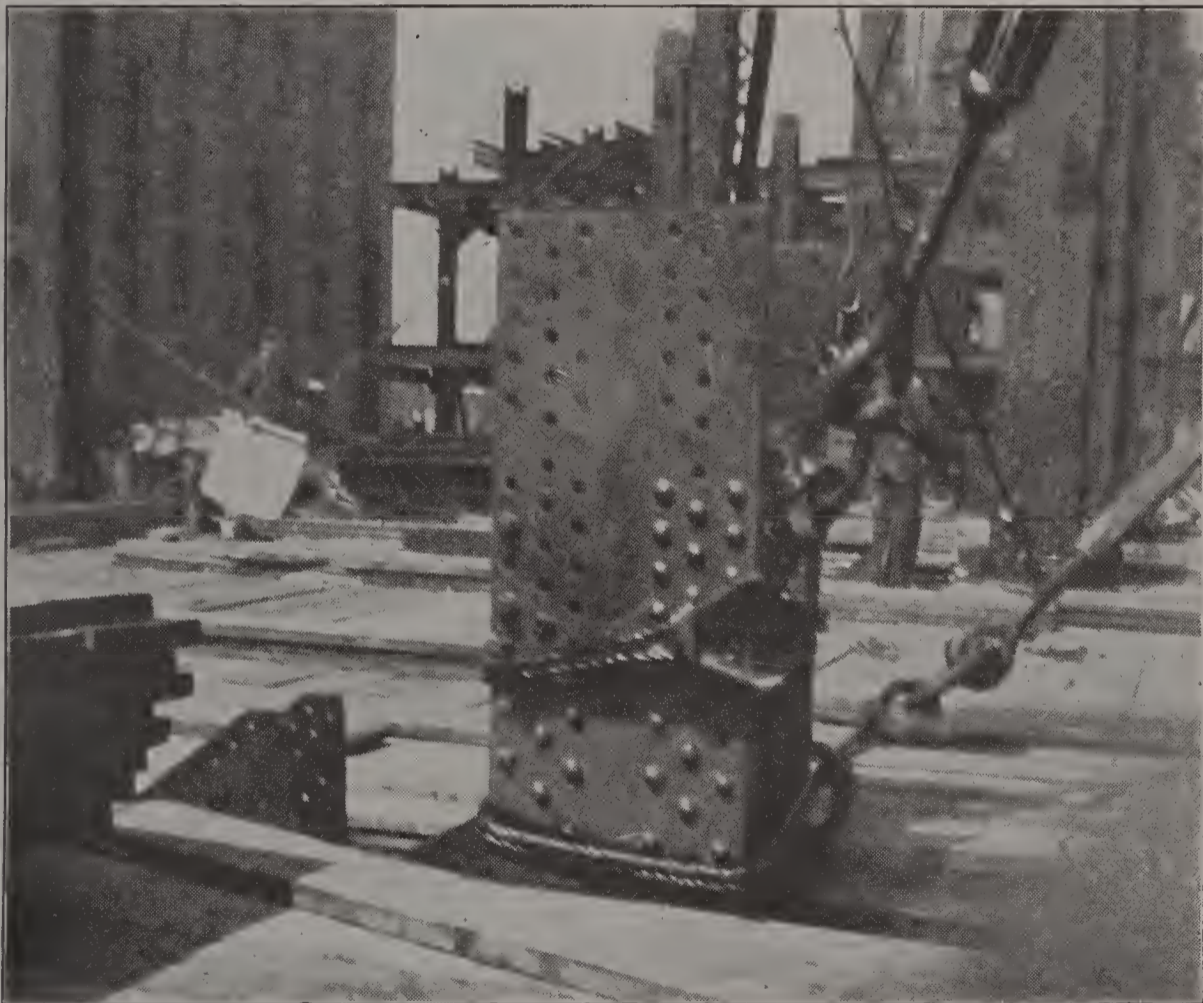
WIRE-CABLE SLINGS INSTALLED FOR ANCHORING DERRICK GUYS.
